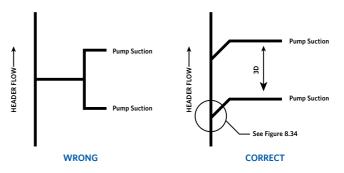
| PLAN VIEW OF PIPE MANIFOLD ARRANGEMENT
